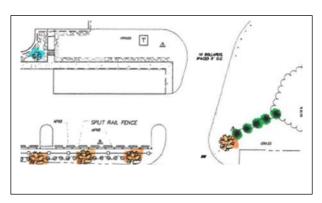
Proposed Approved Southern Parking Planting at the Community Bldg.
